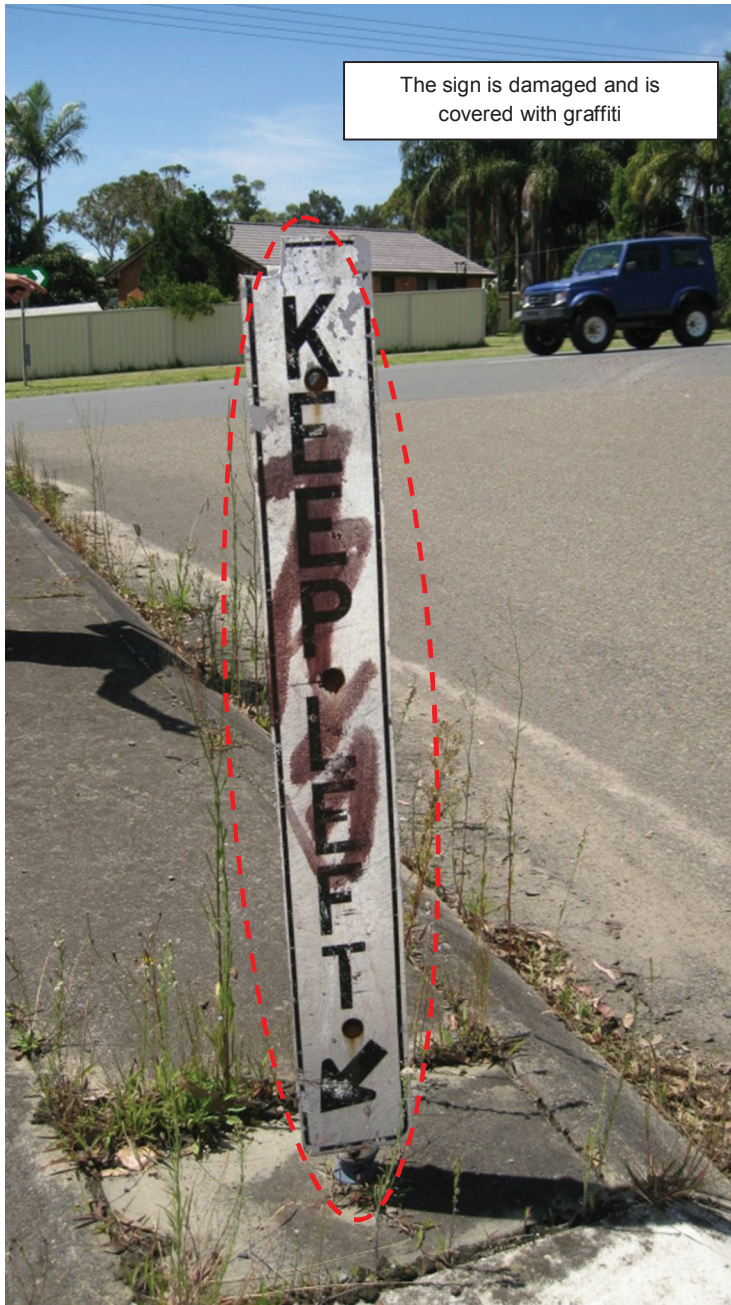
Hue Hue Road, looking north east toward its intersection with Wyee Road
